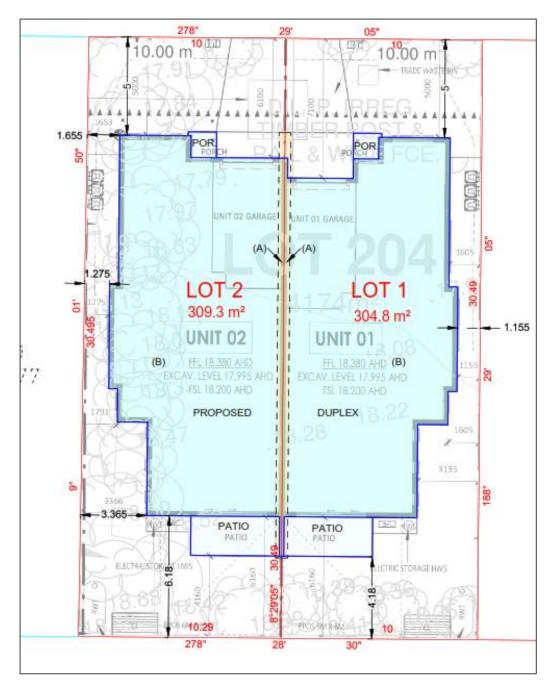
Stage 2 – Proposed Dual Occupancy and Subdivision of Proposed Lot 2042 (source: Le Mottee Group)
